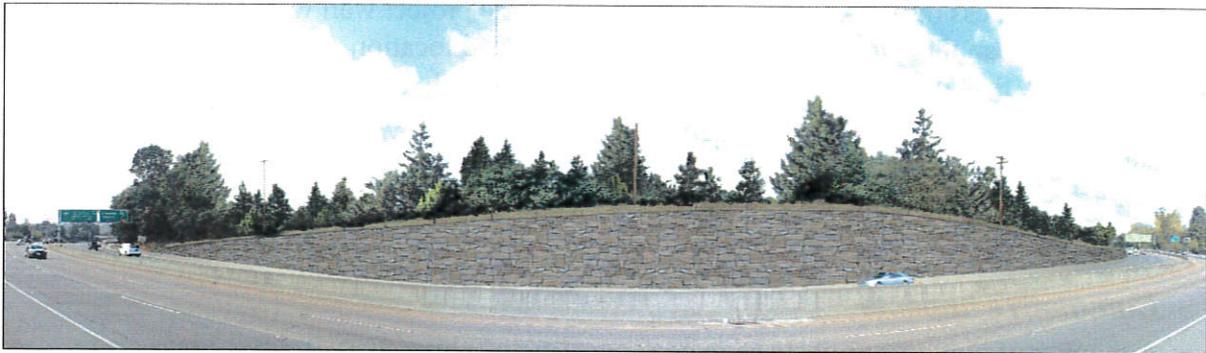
Proposed Condition – Design Options 2 and 3– Soldier Pile Wall and Cast-in-Place Wall
